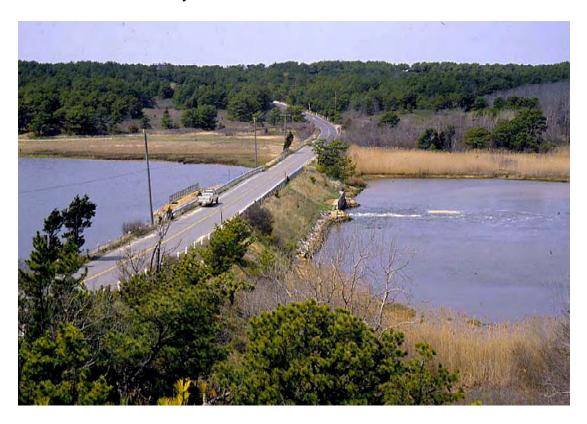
Current Chequessett Neck Road Bridge and culvert structure. Credit: National Park Service.
